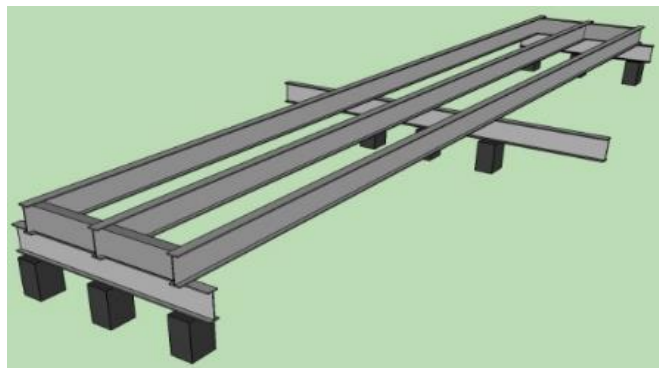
Test setup mimicking rigid (stiff) floorbeam
